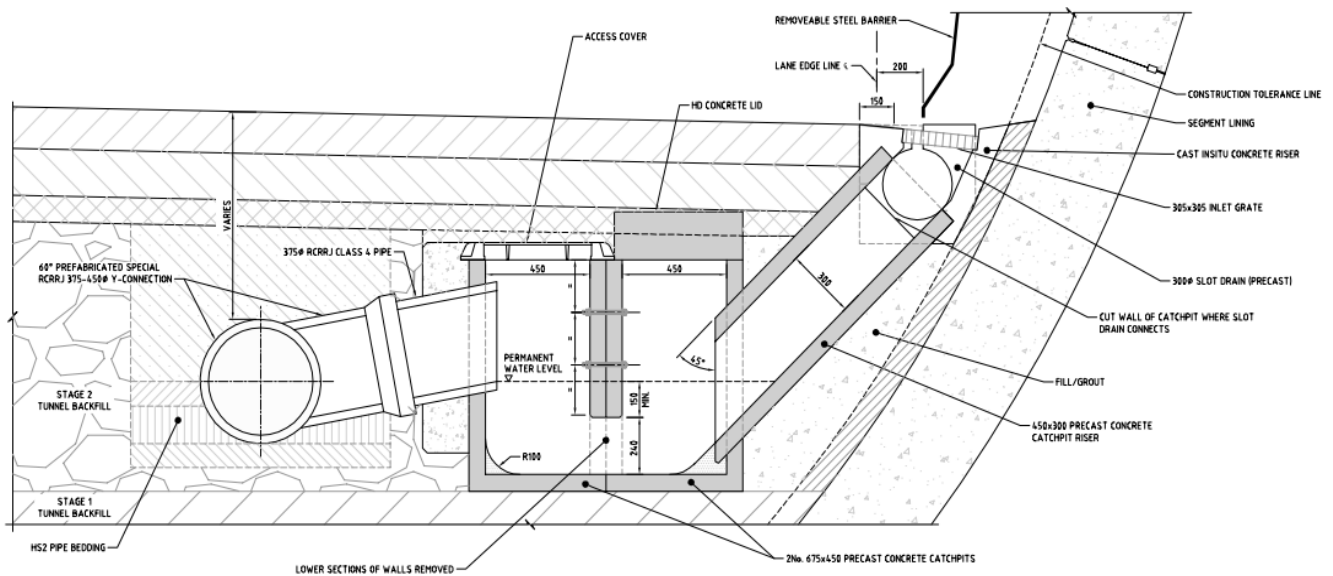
Tunnel catchpit and main carrier pipe cross-section (final design)
